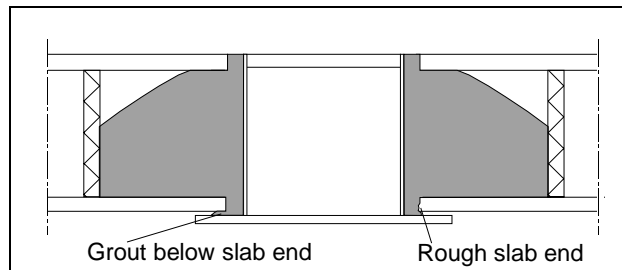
Details affecting the transmission of support reaction between slab and beam. On the left: Grout below slab end. On the right: Rough slab end.
